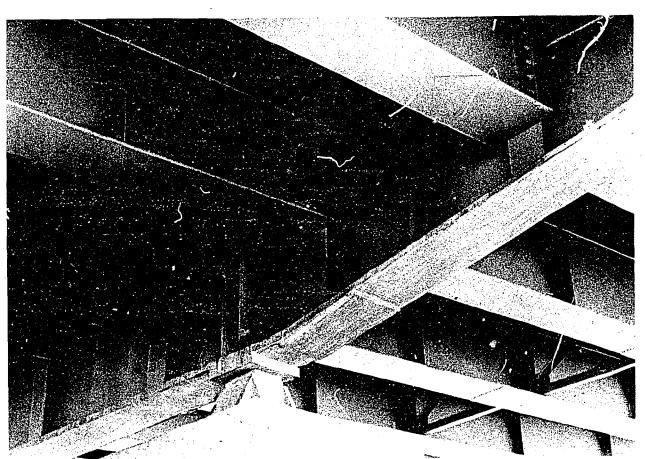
Rods welded to steel members serve as handgrips to facilitate climbing.
